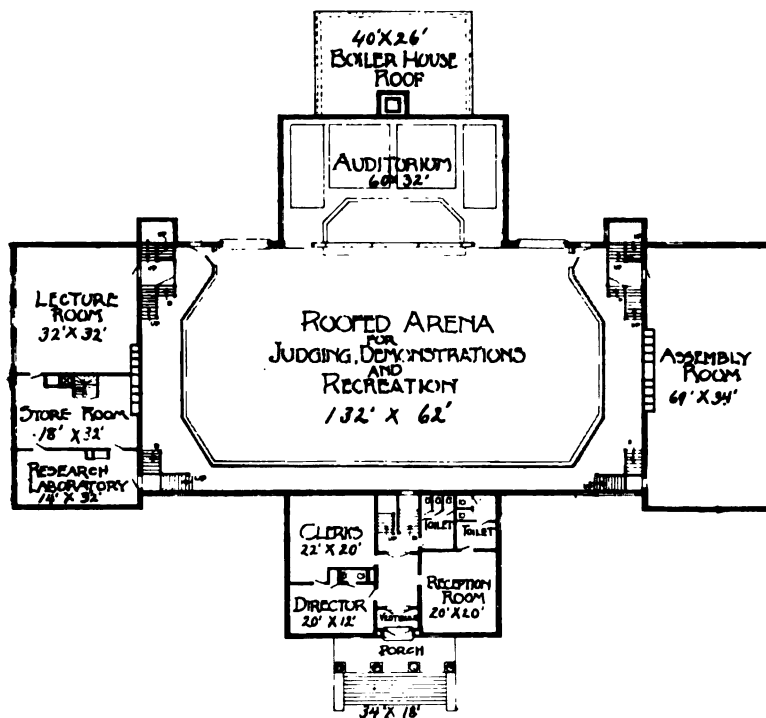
SMITH'S AGRICULTURAL SCHOOL, NORTHAMPTON. FIRST FLOOR PLAN OF MAIN-BUILDING. BY UTILIZING THE CORNERS OF THE ARENA FOR STAIRWAYS, THE ENTIRE FLOOR SPACE IN THE WINGS IS AVAILABLE FOR SCHOOL PURPOSES.
